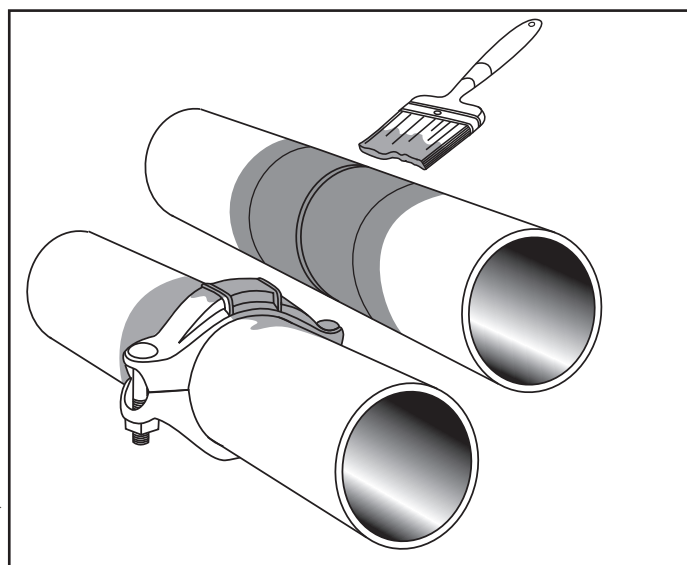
Priming pipes, couplings and welded joints. Apply PREMCOTETM PRIMER to entire area to be wrapped with tape.
